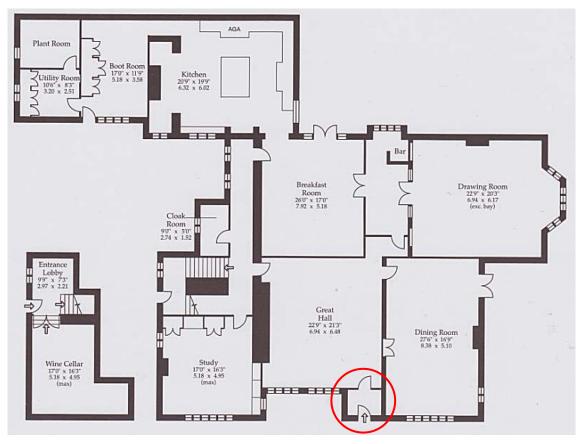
Floor-plan of the ground floor of Kildwick Hall, showing the lobby leading on to the Great Hall.
